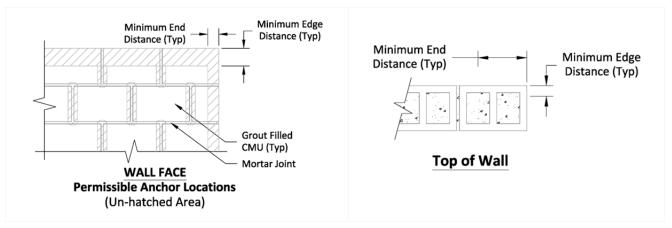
POWER-STUD+ SD1 EXPANSION ANCHORS INSTALLED INTO GROUT-FILLED CONCRETE MASONRY
